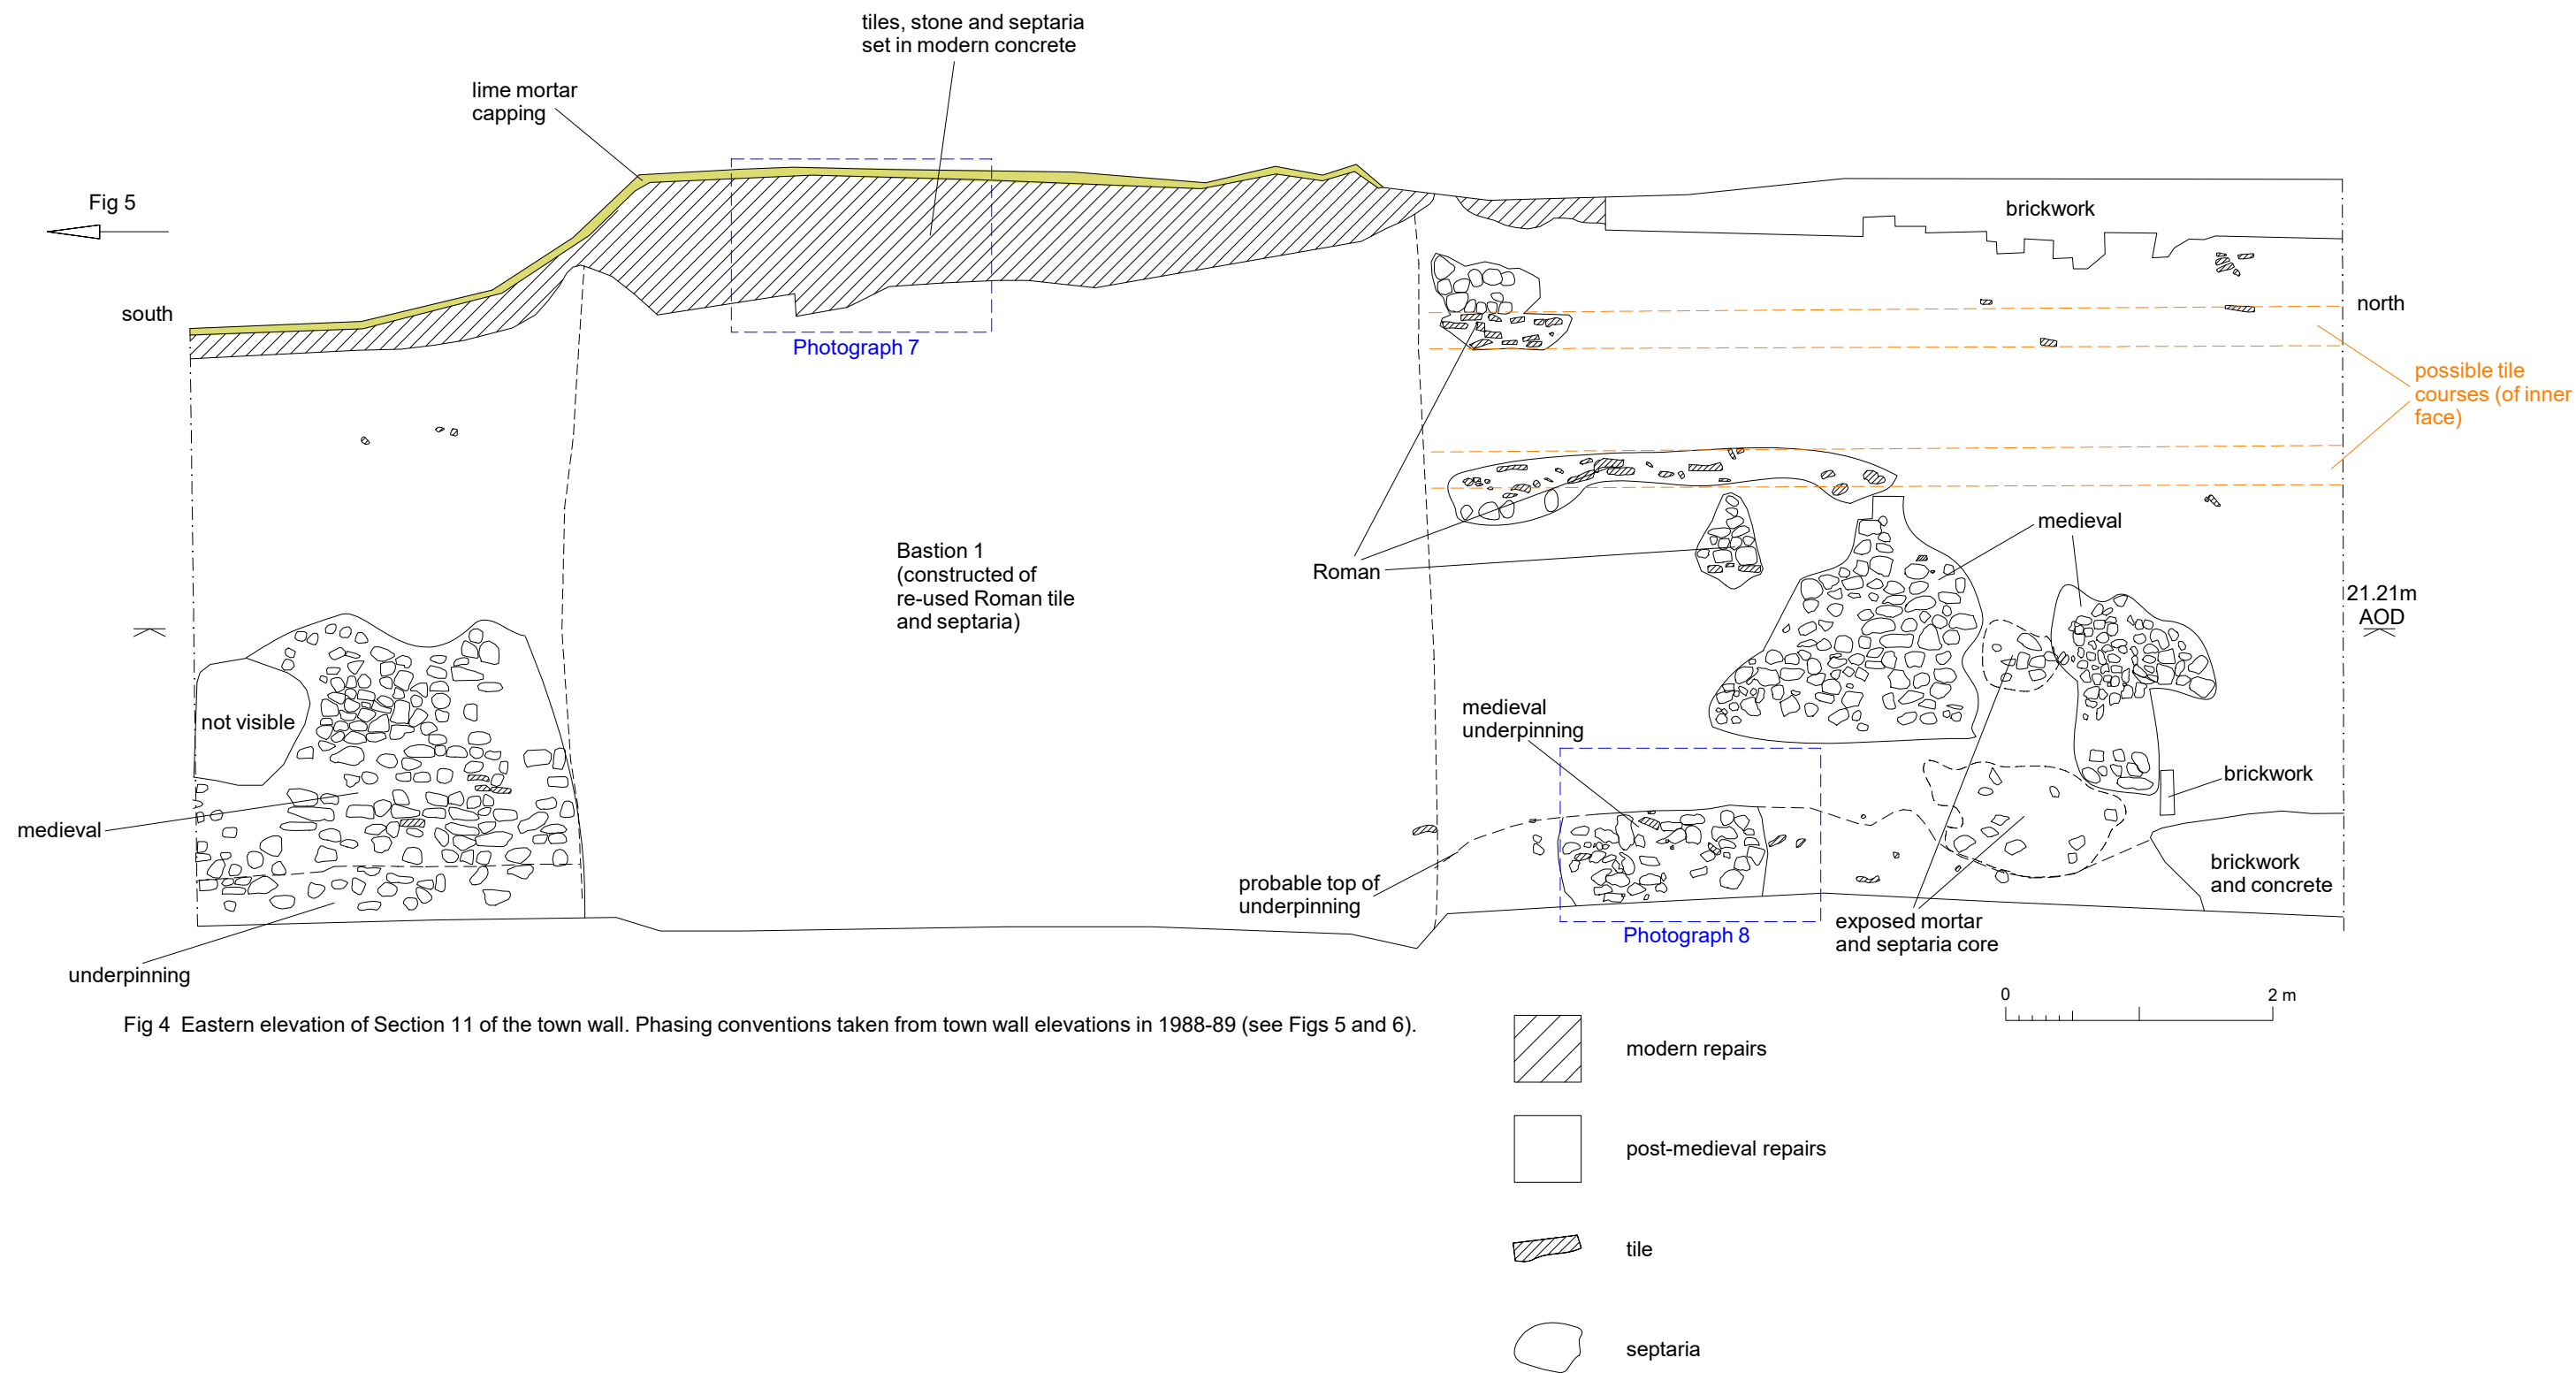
Eastern elevation of Section 11 of the town wall. Phasing conventions taken from town wall elevations in 1988-89 (see Figs 5 and 6).
